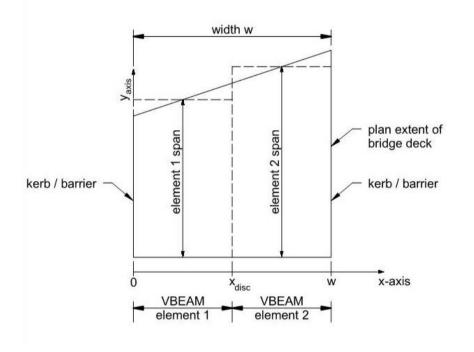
Two VBEAM elements used to model a skewed bridge deck
